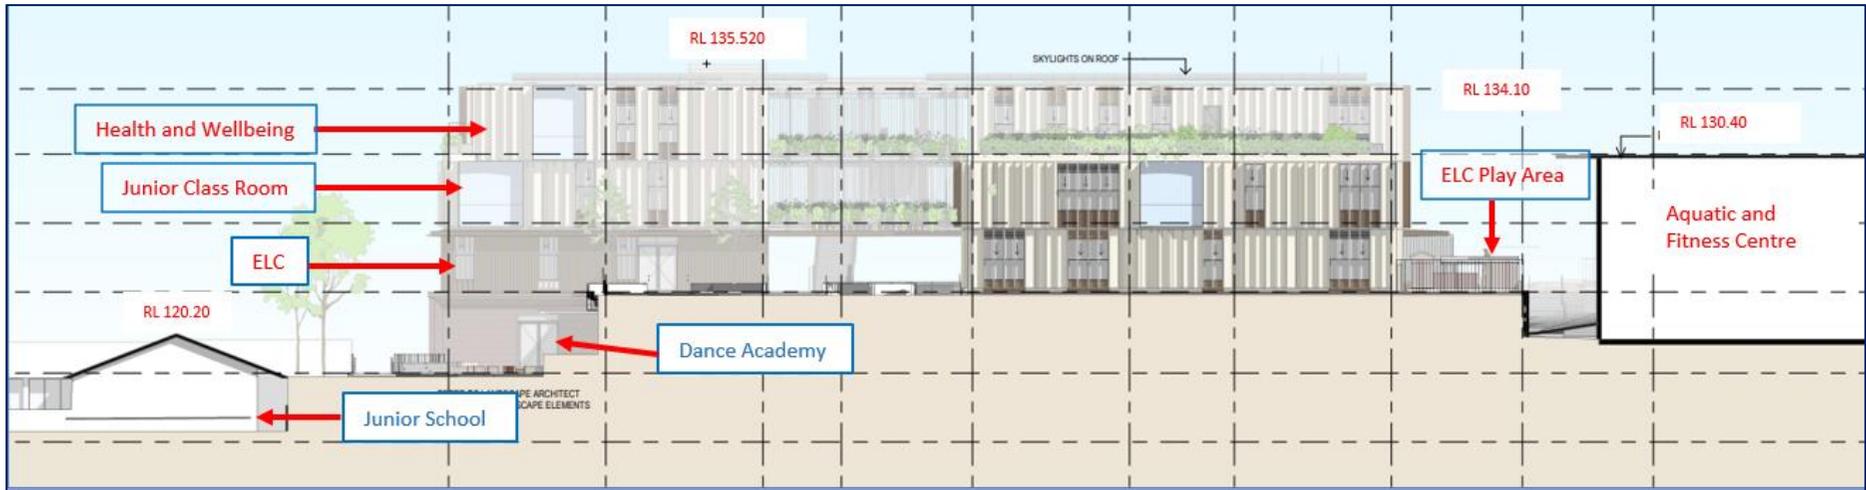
| North-west elevation of the proposed building (Source: Applicant's RtS 2022)
